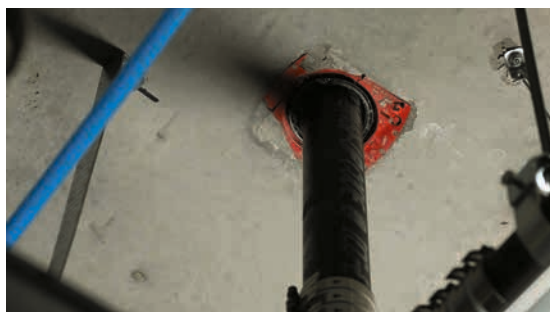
Device flange should be secured to the top surface as per listed system Hilti CFS-DID
